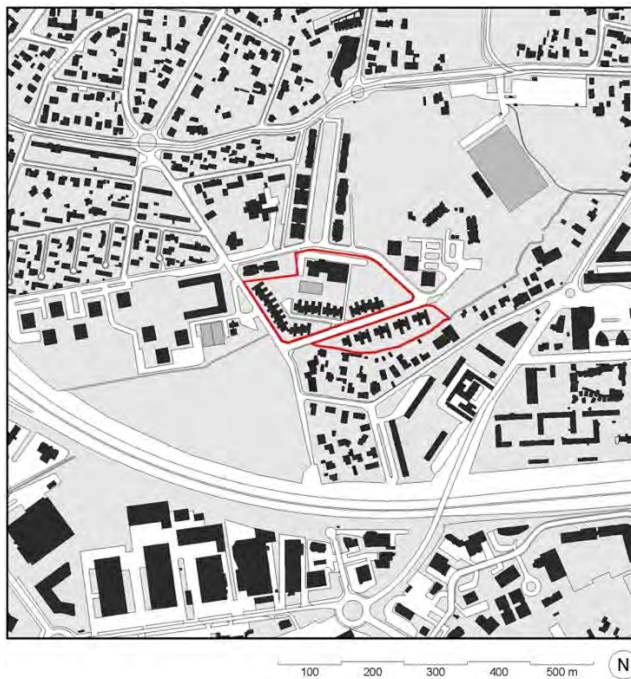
Pontet Extension IV. Situation plan. Source: (Author, 2017).
